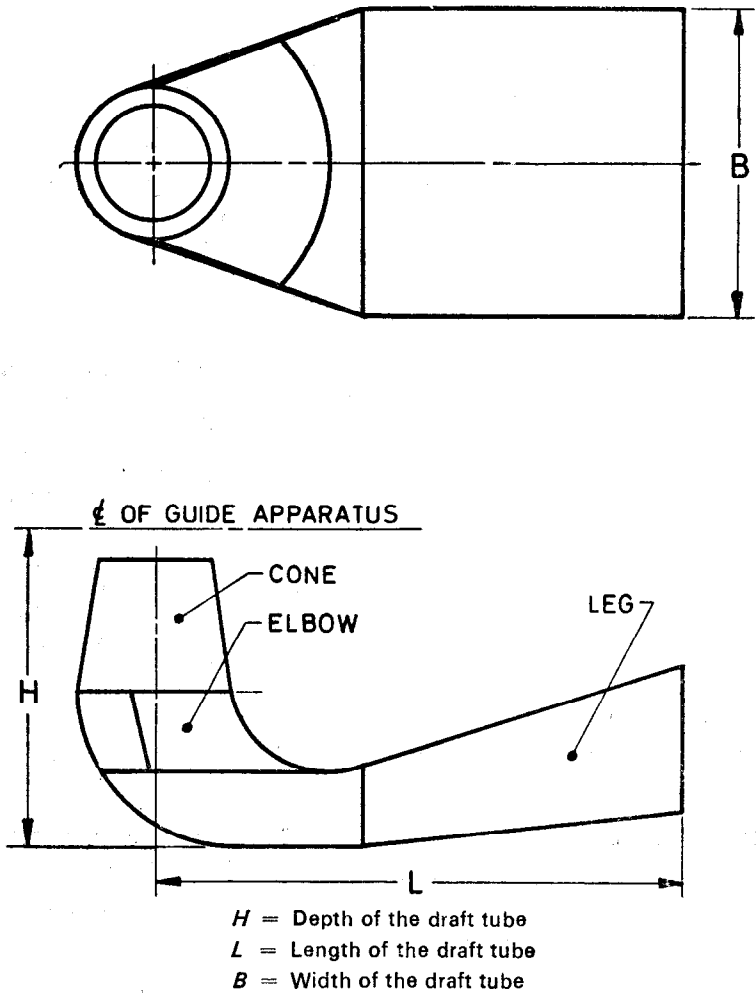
DRAFT TUBE DESIGN TYPE 1 ( FOR HEADS UP TO 200-250 m )
